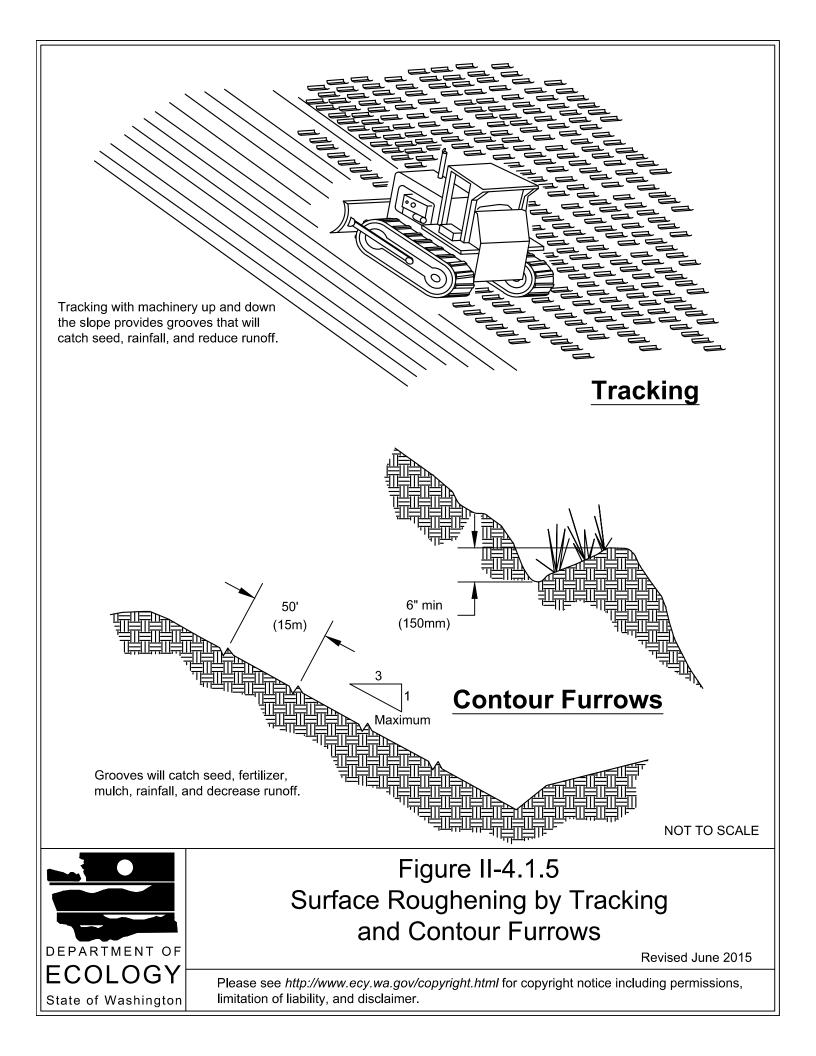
Surface Roughening by Tracking and Contour Furrows
